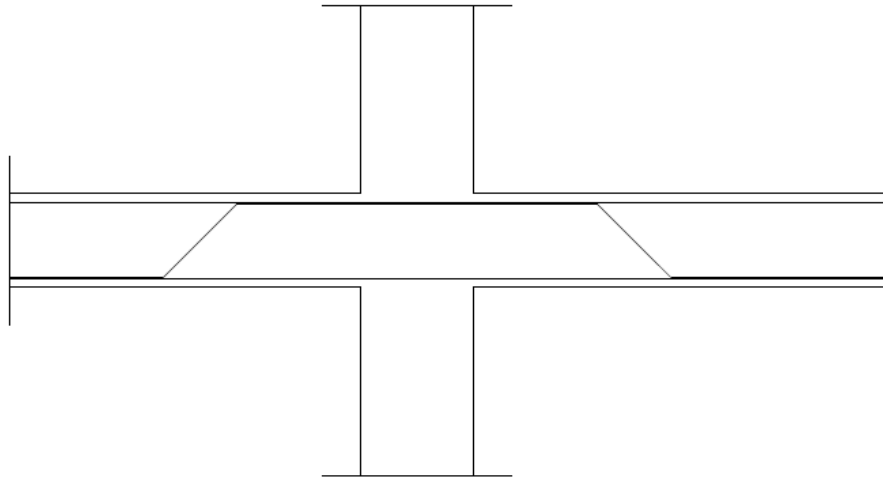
Beam Longitudinal Reinforcement at the Bottom of the Section in the Mid-spans and at the Upper Side at the Edge-spans
